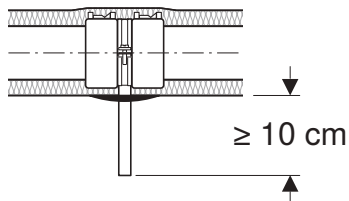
Anchor point for insulated Geberit discharge pipes embedded in concrete
